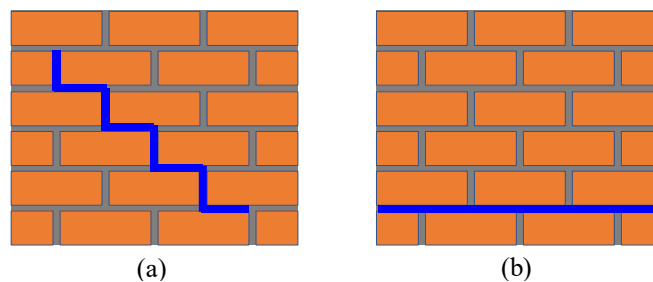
Failure modes of masonry panels subjected to shear force: (a) diagonal stepped crack and, (b) horizontal crack.
